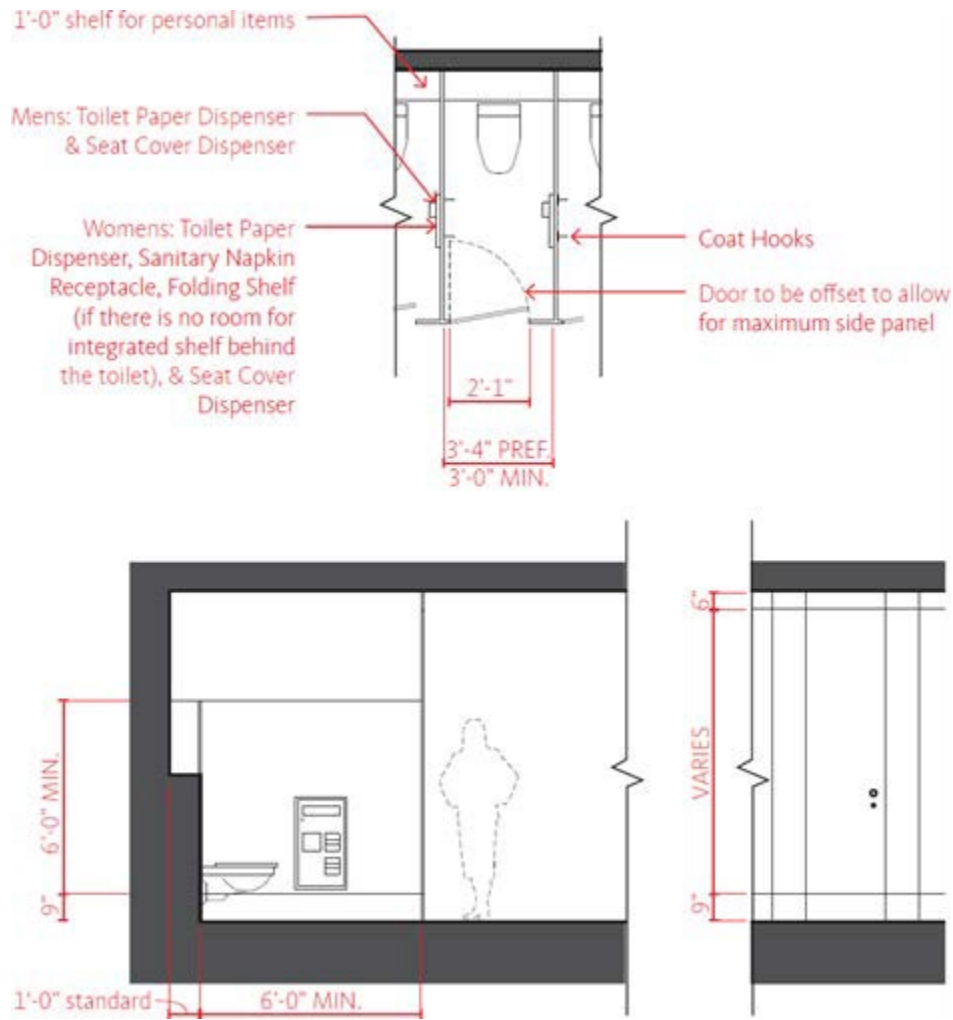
Toilet Compartment Plan, Elevation, and Section
